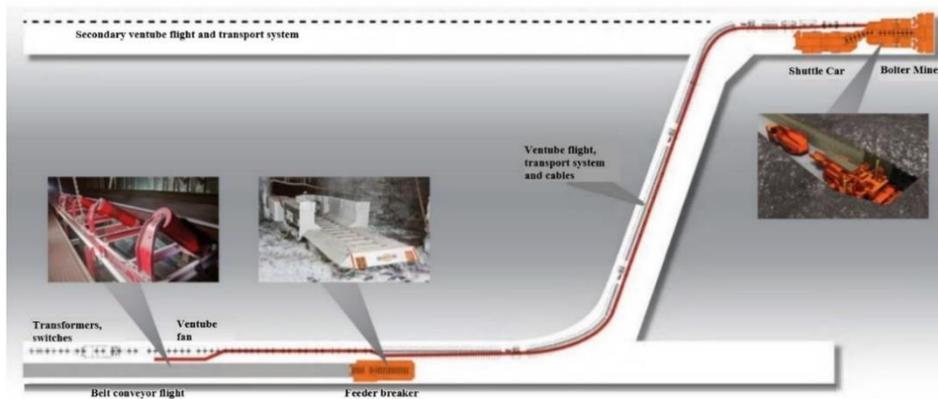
Basic elements of heading face technical system with Bolter Miner machine [8]
